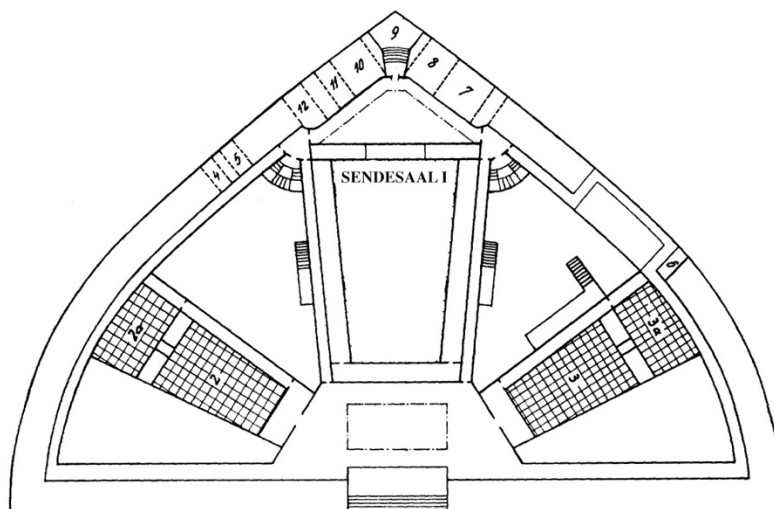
A floor plan of Haus des Rundfunks with Sendesaal I labelled in the centre. The distinctive quadrilateral floor plan of Sendesaal I and the other visible recording spaces (2, 2a, 3, 3a) are an important component of the facility's acoustic design enabled by the building's dedication to a single purpose.⁸
